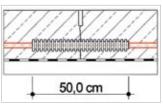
Dummy joint, pressed joint with REHAU protective sleeve
